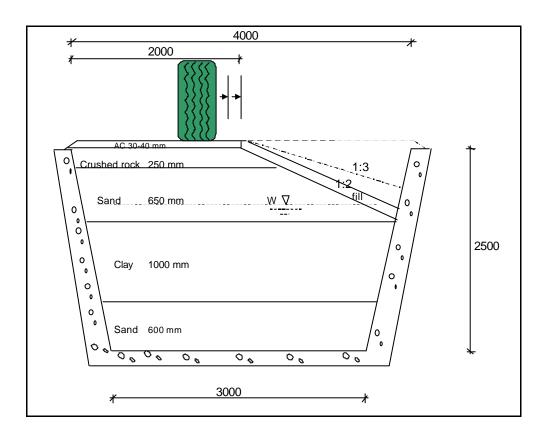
HVS pavement structures in Low volume road research project in Finland 2000 - 2001.
